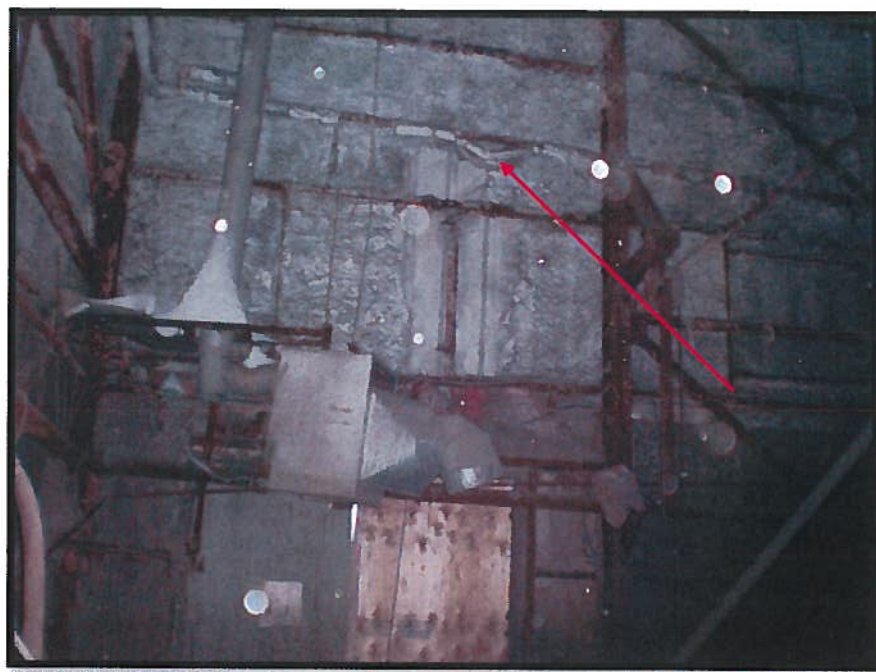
Delaminating Ceiling Insulation Materials, Non-Asbestos (Sample 31).
